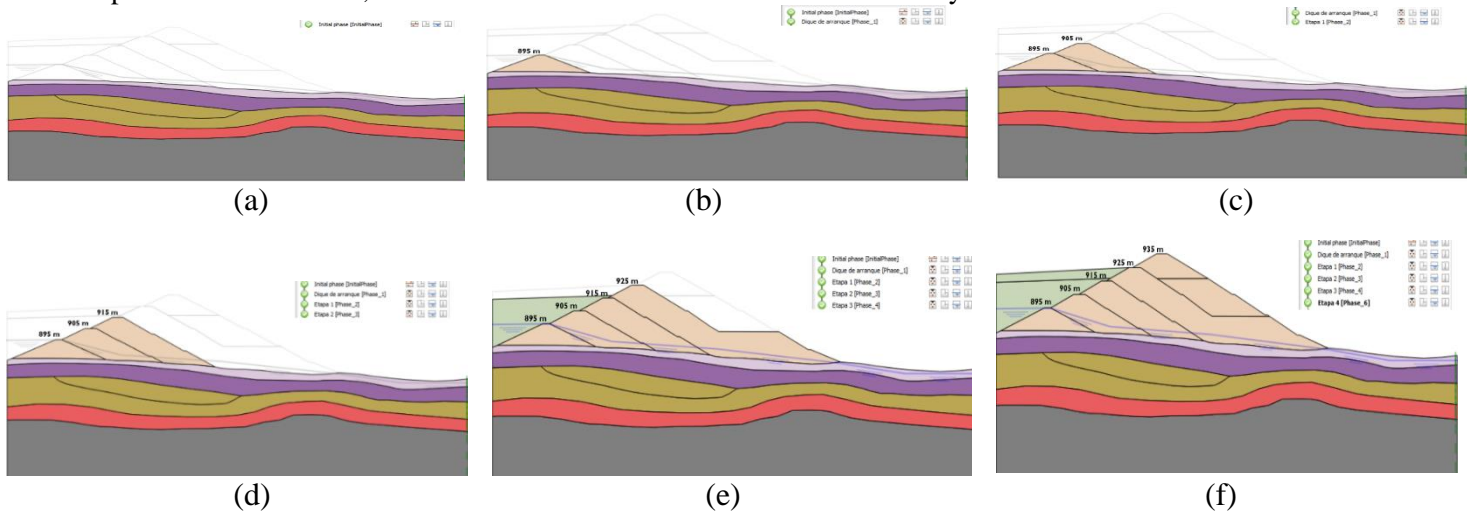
(a) Tailings dam analysis section; (b) Initial stage – Starter dam at 895m elevation; (c) Stage 1 - Dam raise at elevation 905m; (d) Stage 2 – Dam raise at elevation 915m; (e) Stage 3 – Dam raise at elevation 925m; (f) Stage 3 – Dam raise at elevation 925m.
